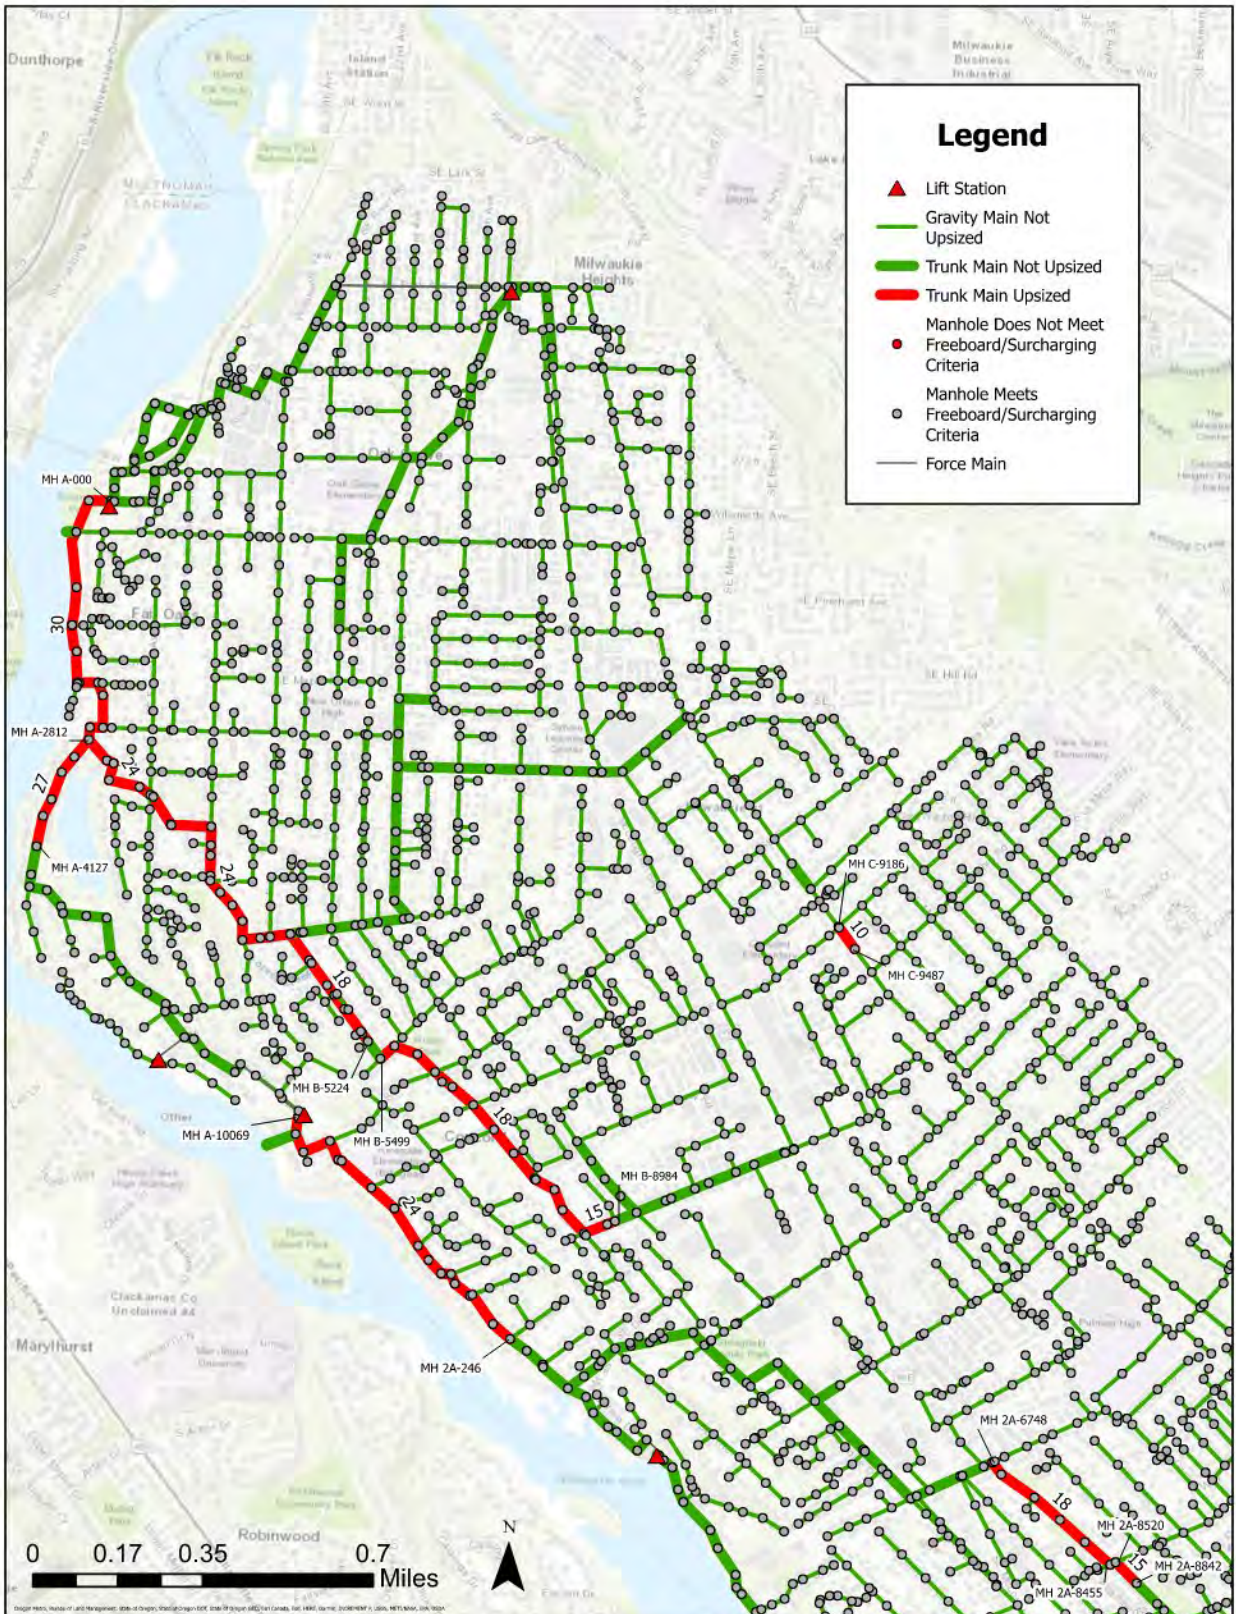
Recommended Gravity Main Upgrades (Existing and Buildout Loading)
